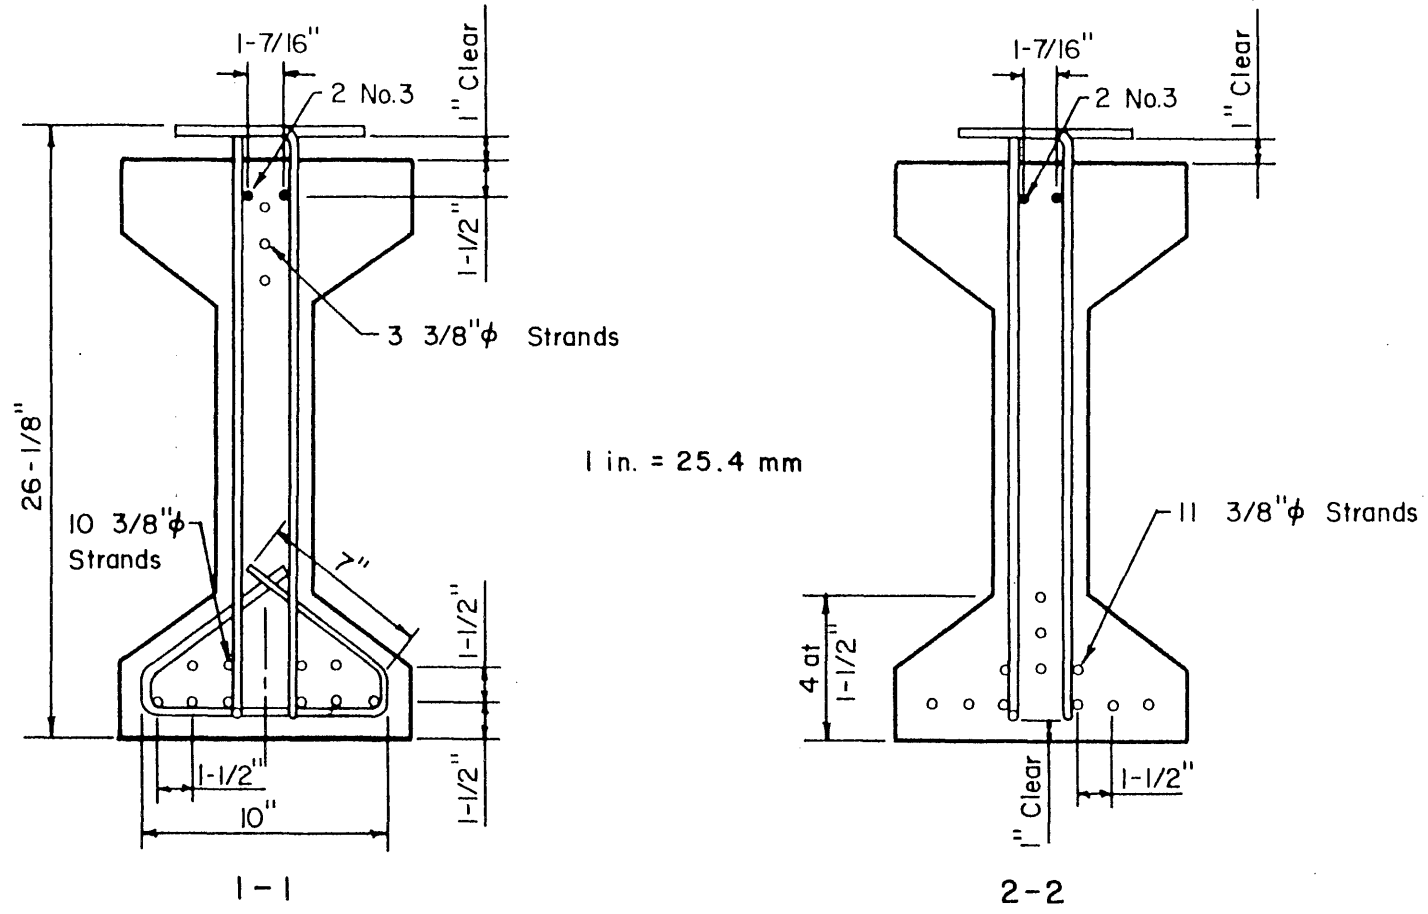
CROSS SECTIONS OF GIRDER AT ABUTMENT END AND MIDSPAN OF END SEGMENT, MODEL 2
